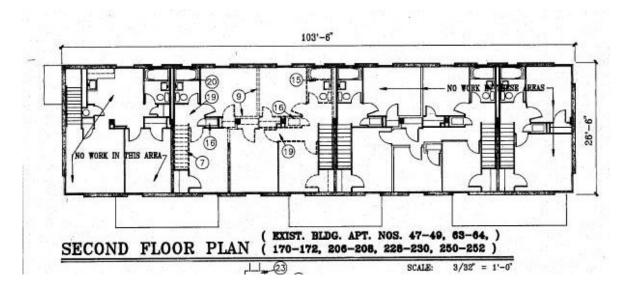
Key plan locations of interior photographs, typical two story apartment plan for Type A and A1. Accessibility Alterations for Tays Complex – TX3-002 / TX3-003 / TX3-015A; sheet number A1 – Demolition Plans, dated March 1993. Courtesy of HACEP.
